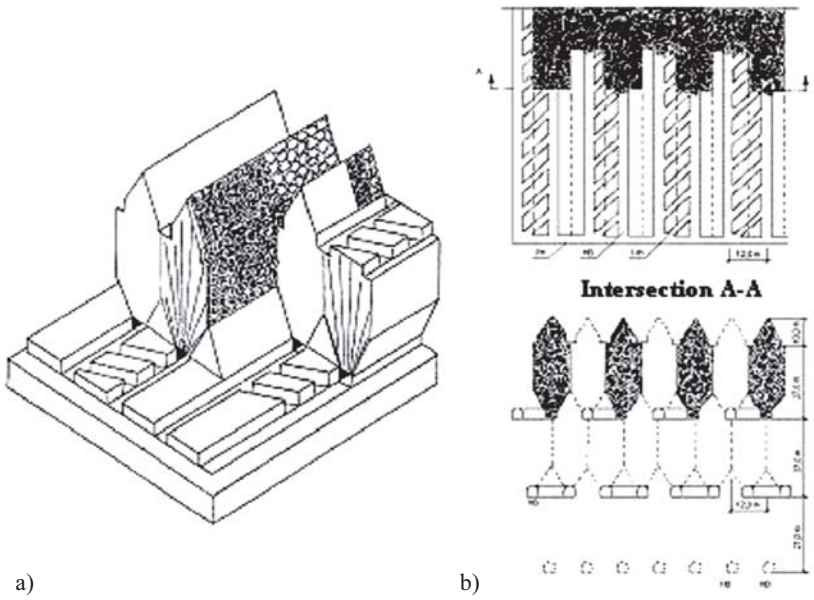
Sublevel Caving in Compressed Environment with Shrinkage Mining: a) axonometric Plan; b) horizontal and vertical sectionplanes of the method^[8]
